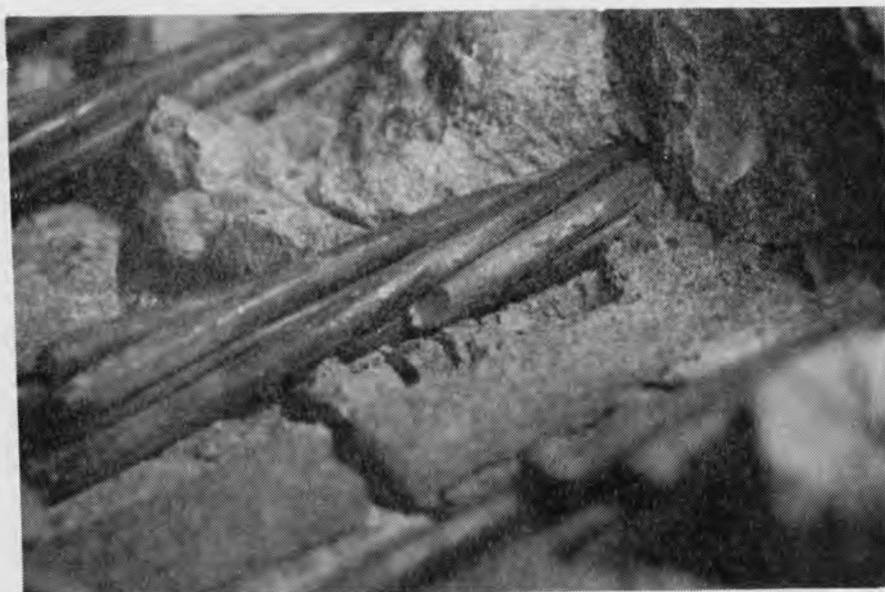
Wire fatigue fractures for Specimen C-14-NP-5.5-OL-2.29
